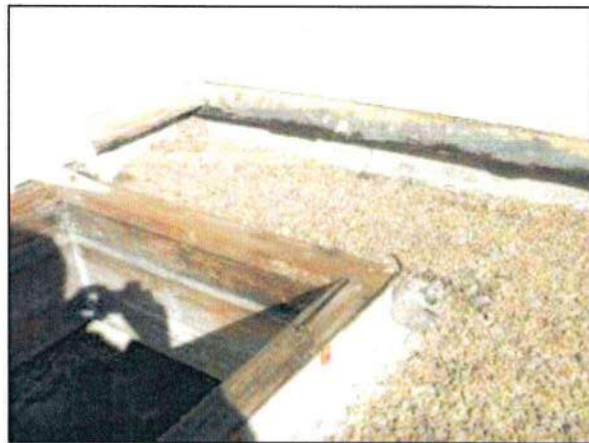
Fire Station #1 The hose tower roof requires a new roof hatch and curb.
